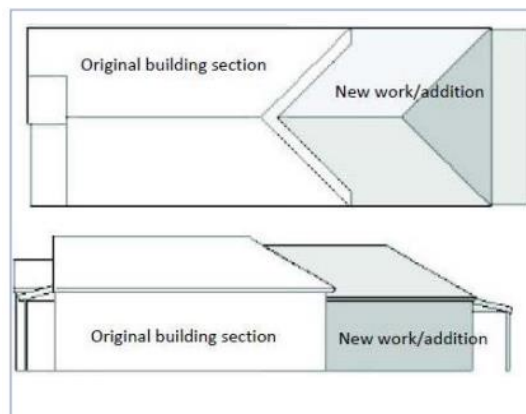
(b) - Alterations and additions to be smaller in scale and length than the existing building. (i)
